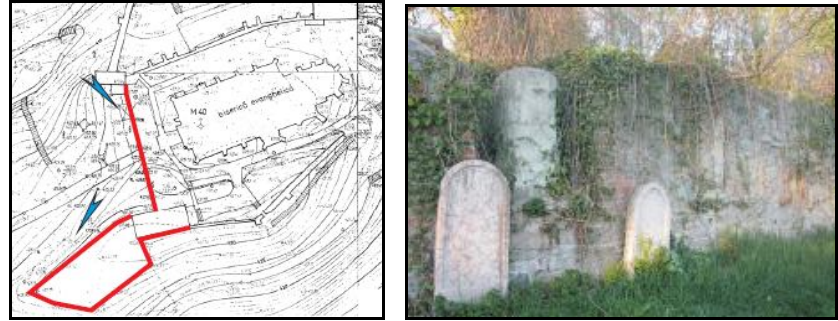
The fortress wall – Section 18, Plan and image, 2007
